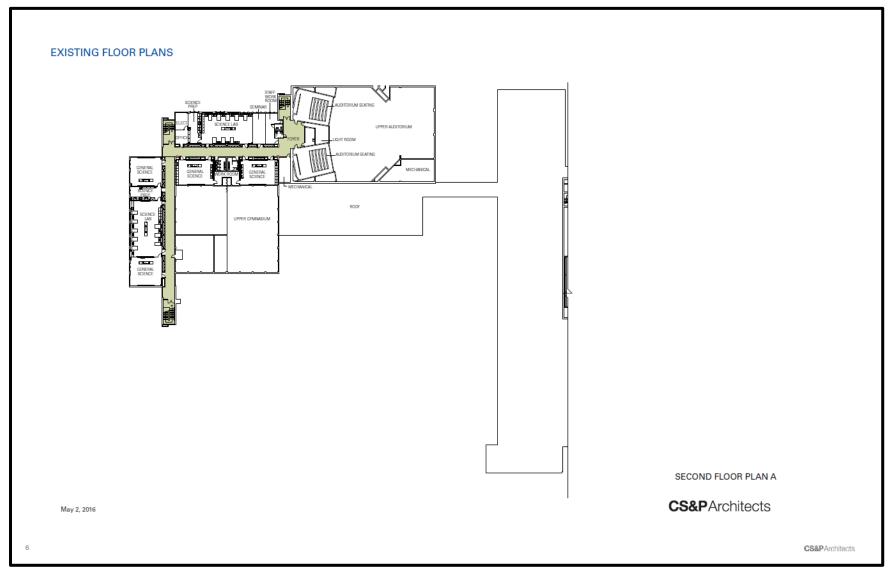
West Wing (Plan A) Second Floor (CS&P Architects 2016:6)
